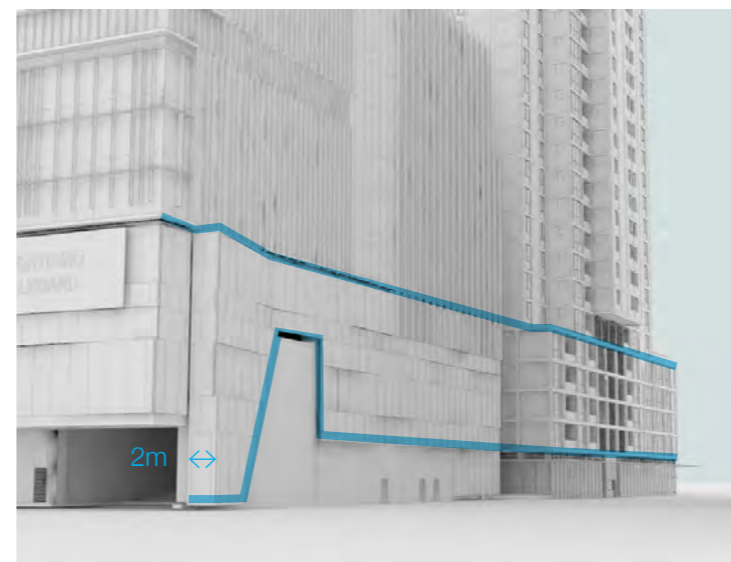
NW Plot maintaining Darling Drive street wall alignment with SW Plot's podium. View from north west.
